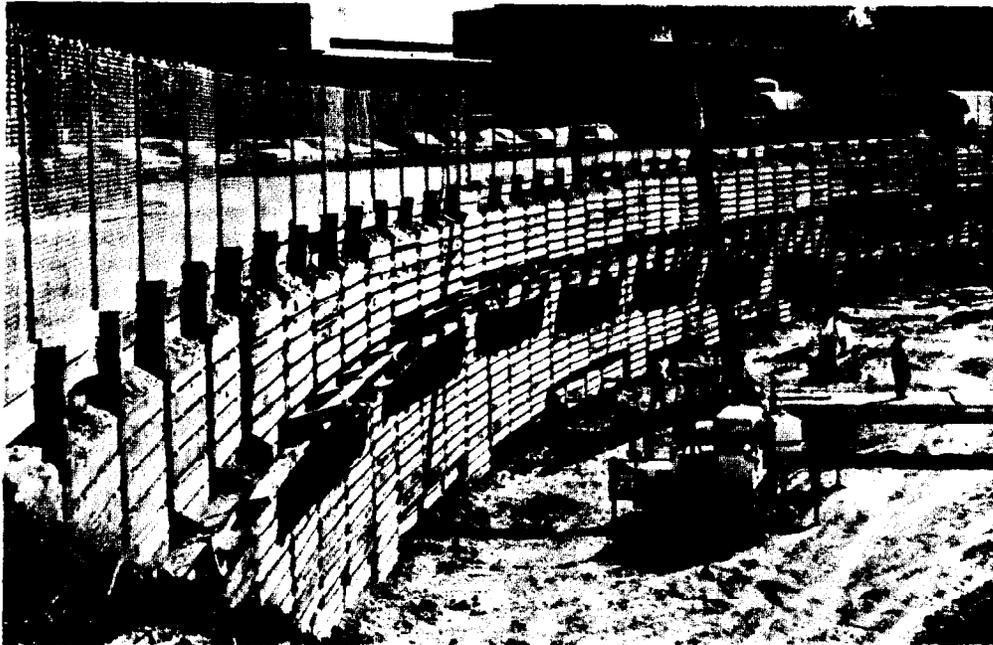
Prestressed Soil Anchors used to tie-back a wall of soldier piles with wooden lagging.
